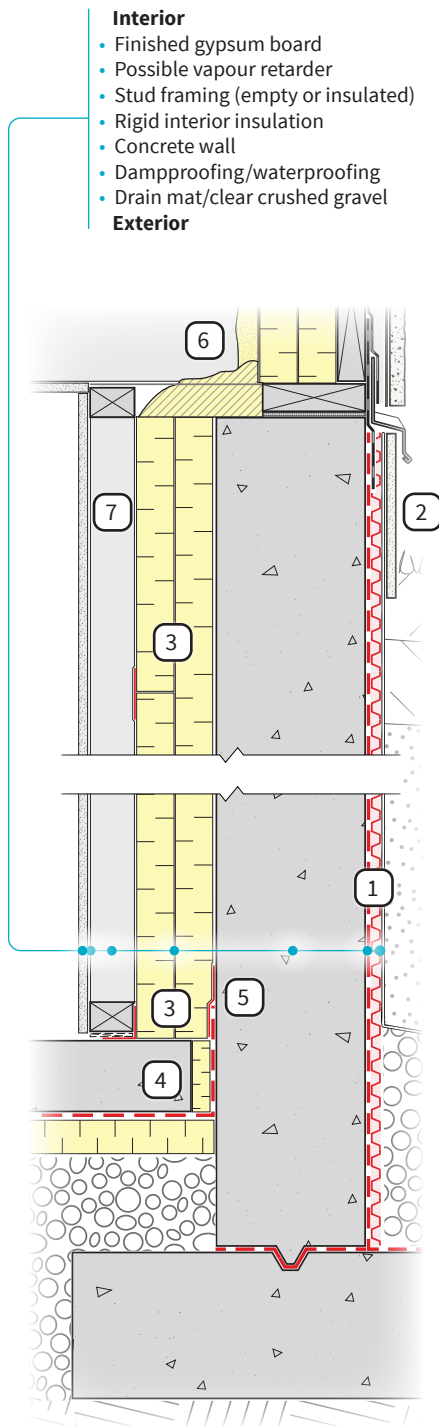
Better practice for conventional interior-insulated foundation wall.
